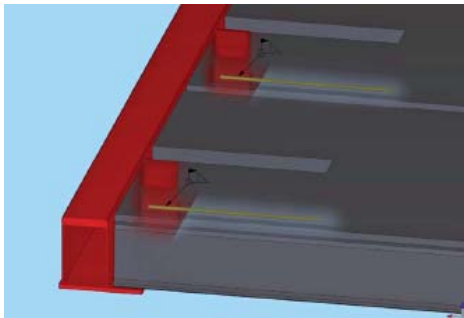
Principle connection of deck elements to one sided HSQ beam.
